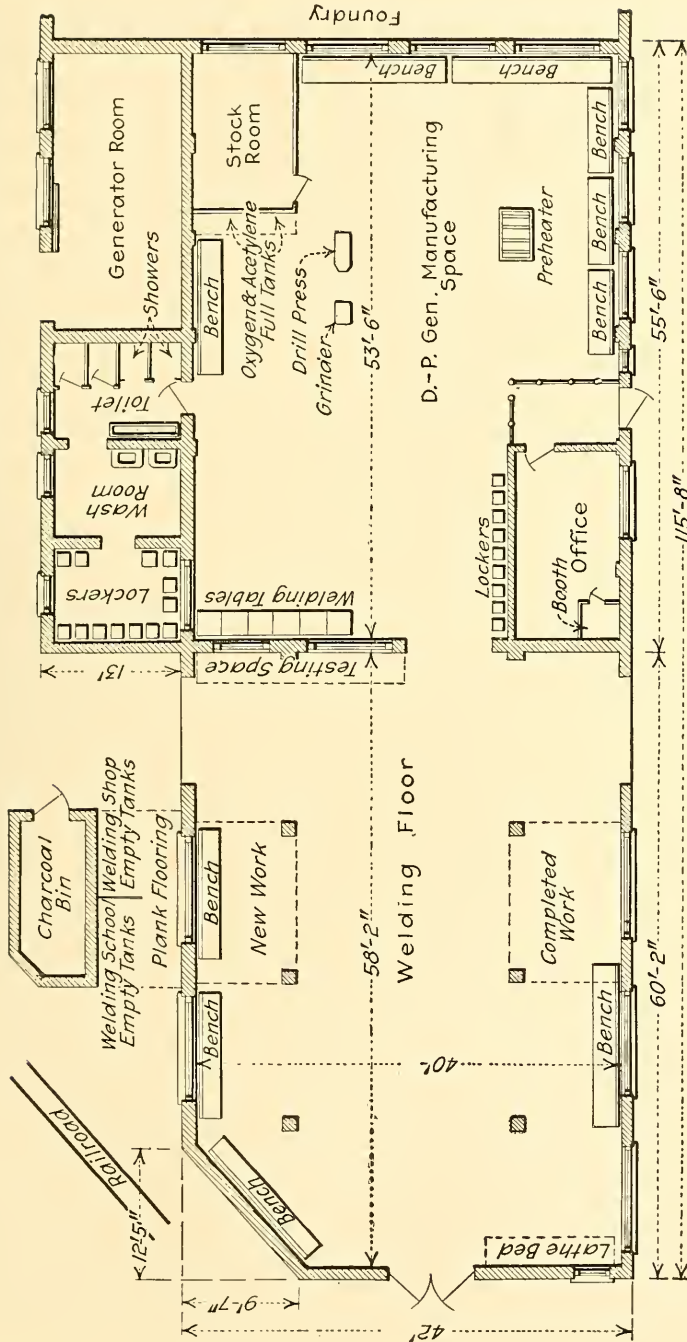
1st Floor Plan of Oxweld Shop.
